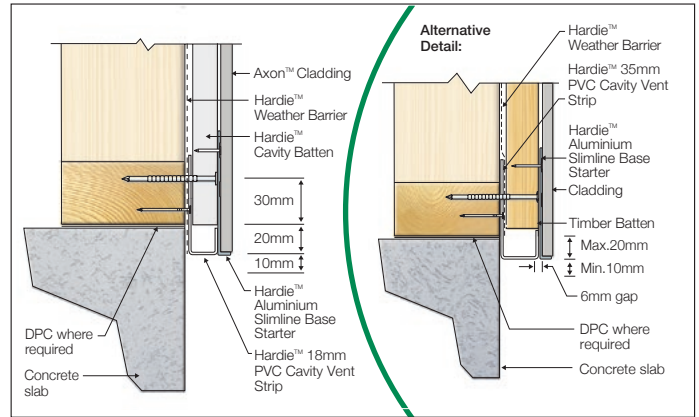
ALTERNATIVE SLAB EDGE DETAILS
